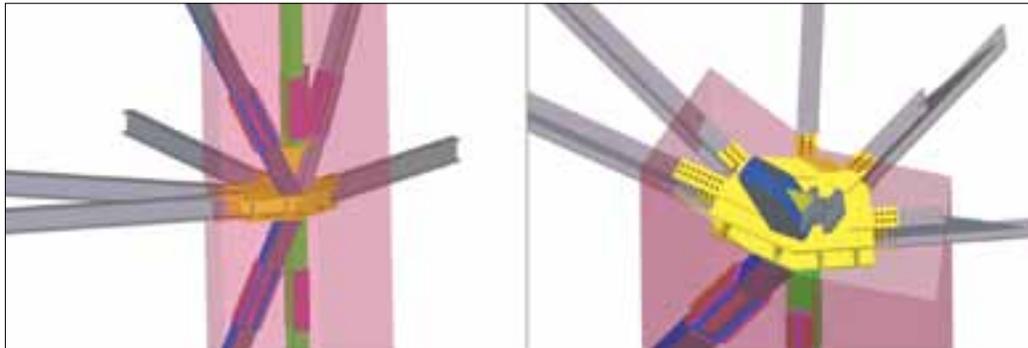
Steel Diagonal/Megacolumn Connection (TEKLA)
